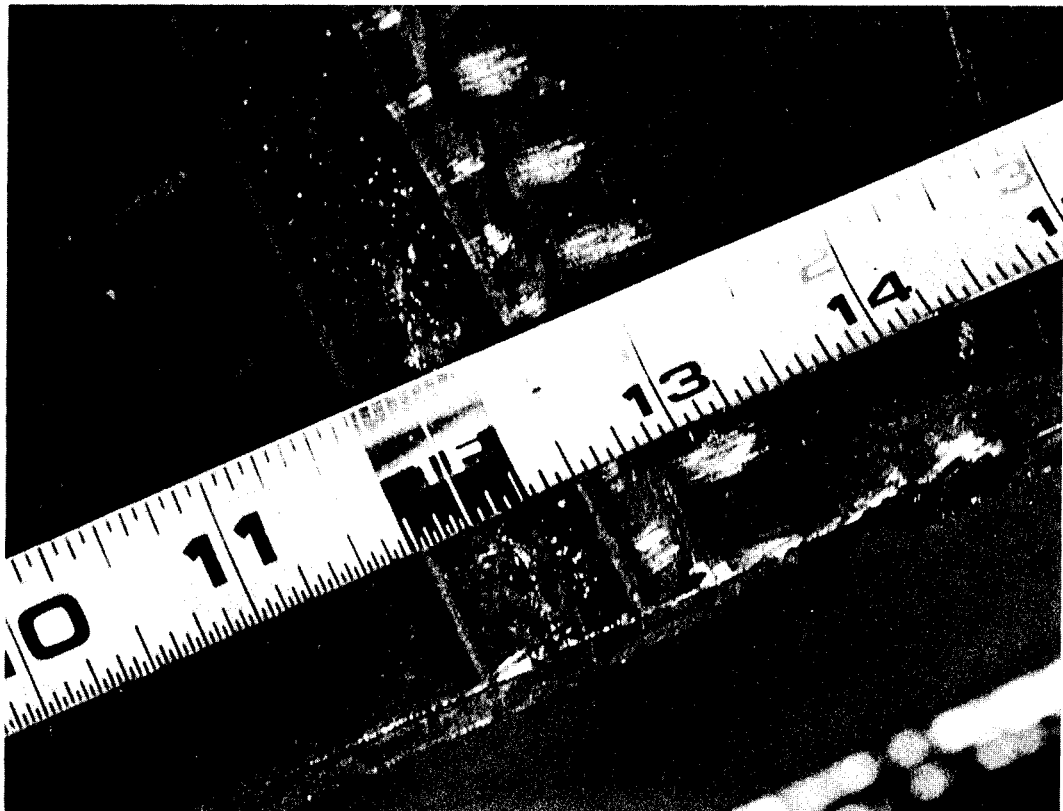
EDGE NOTCH IN FLANGE TIP
